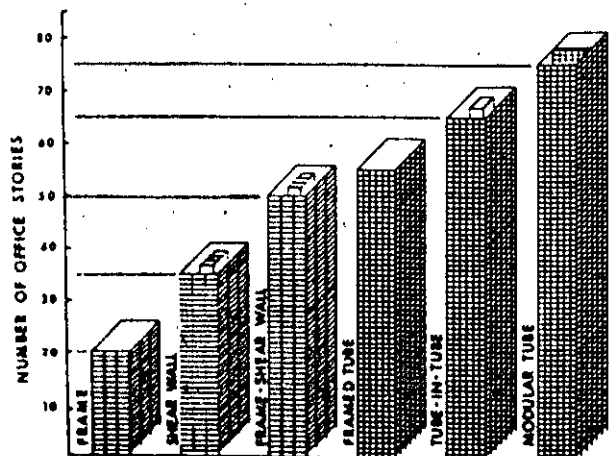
Concrete structural systems for office buildings (Khan, 1974)
